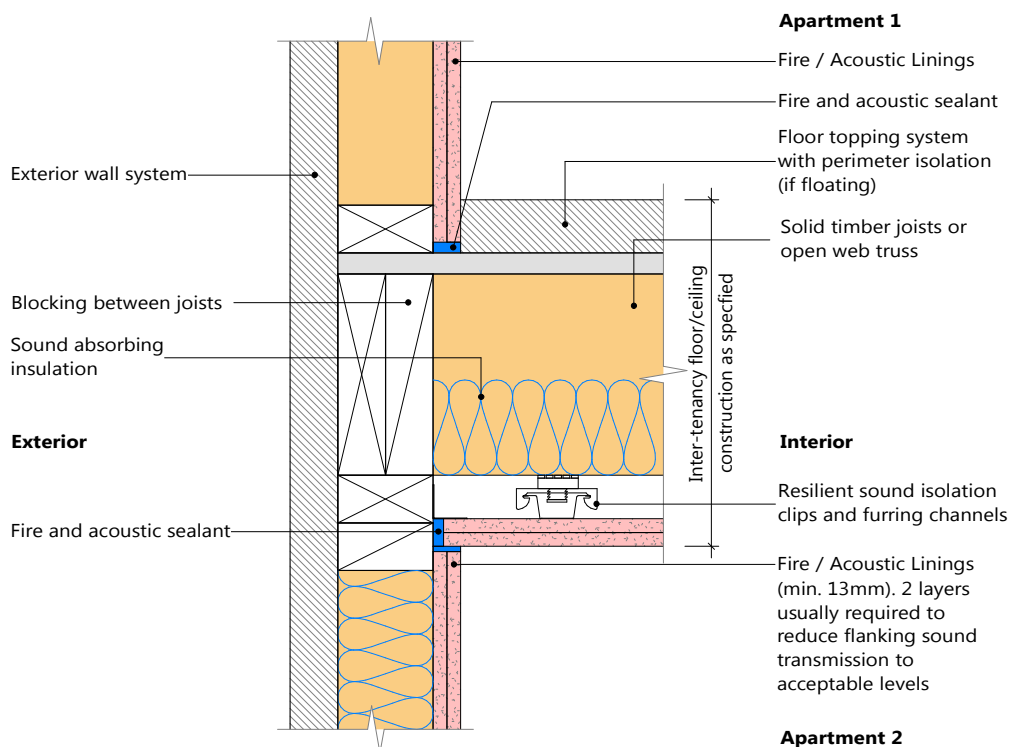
Conceptual details for intertenancy floor / exterior wall junction.
